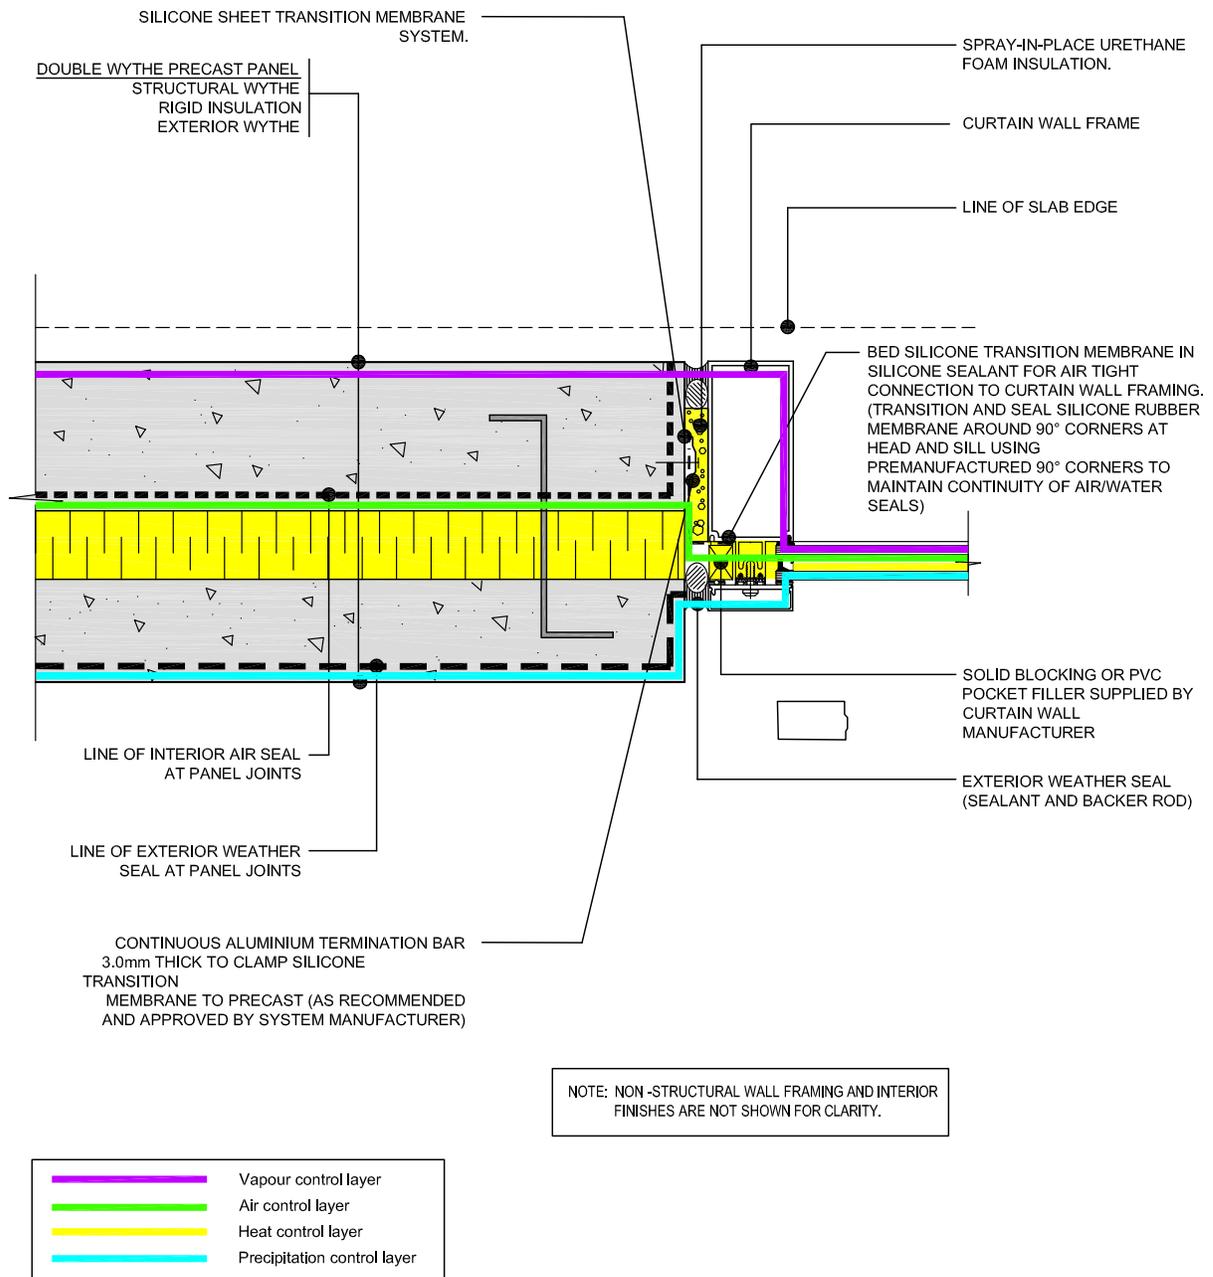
Double wythe precast panel—connection to door head.
